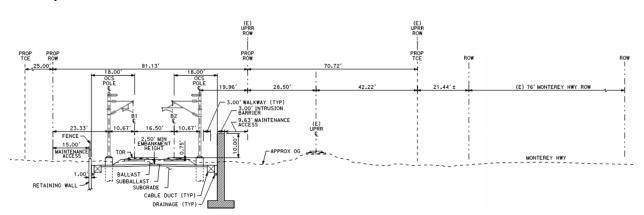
Typical Sections in Subsection Morgan Hill and Gilroy (Embankment)
